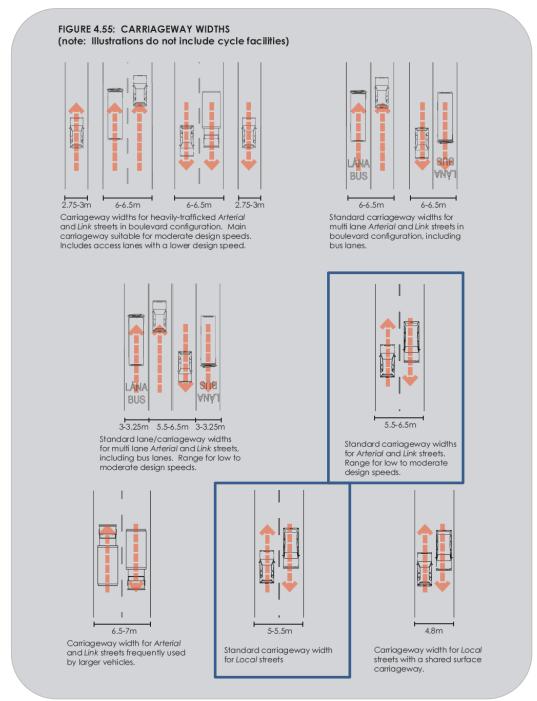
Carriageway Widths (source: Design Manual for Urban Roads and Streets)
